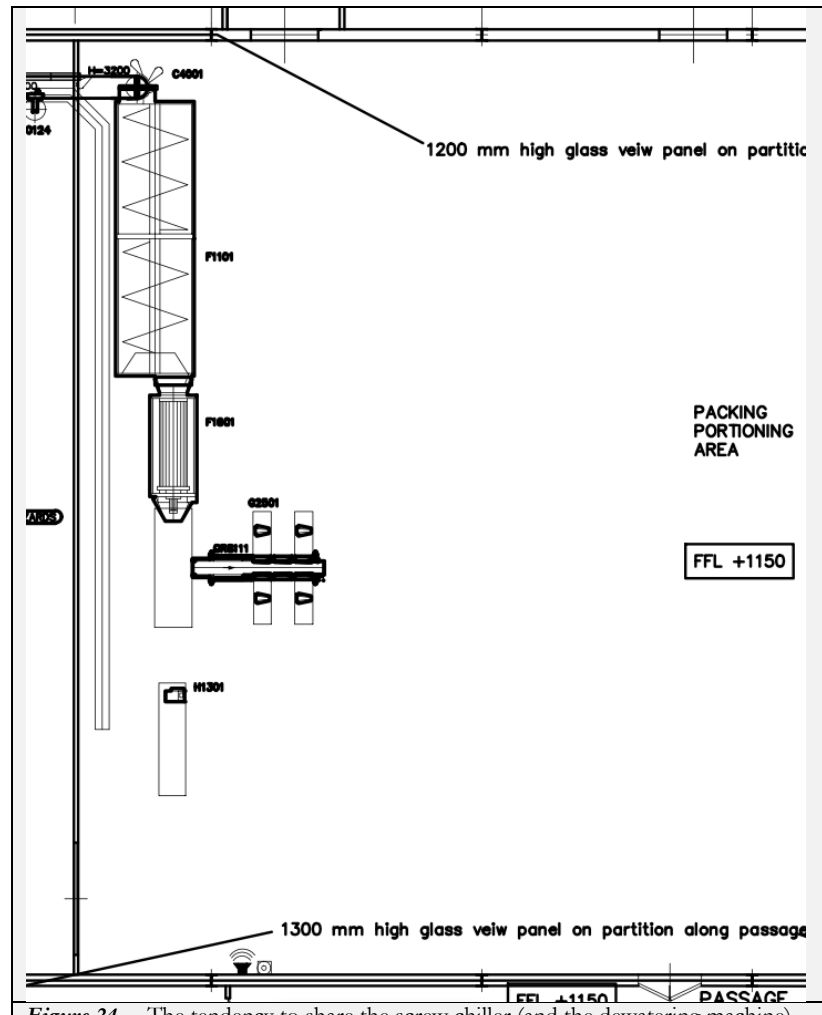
The tendency to share the screw chiller (and the dewatering machine) with the packing area is common to the draftsmen in both the leading poultry slaughterhouse equipment manufacturers and designers. Shown here is how Aptec’s original design was ‘improved’ by this Dutch vendor for a plant in Sri Lanka. The draftsmen also reduced the ceiling height of the packing room thereby adding to the problem. A 6 metre clear height had been specified in Aptec’s original design. A few months following commissioning of this plant, the owner sought this author’s advice for solving condensation problem in the packing hall. Aptec replied with instructions to do away with the “improvements”.
